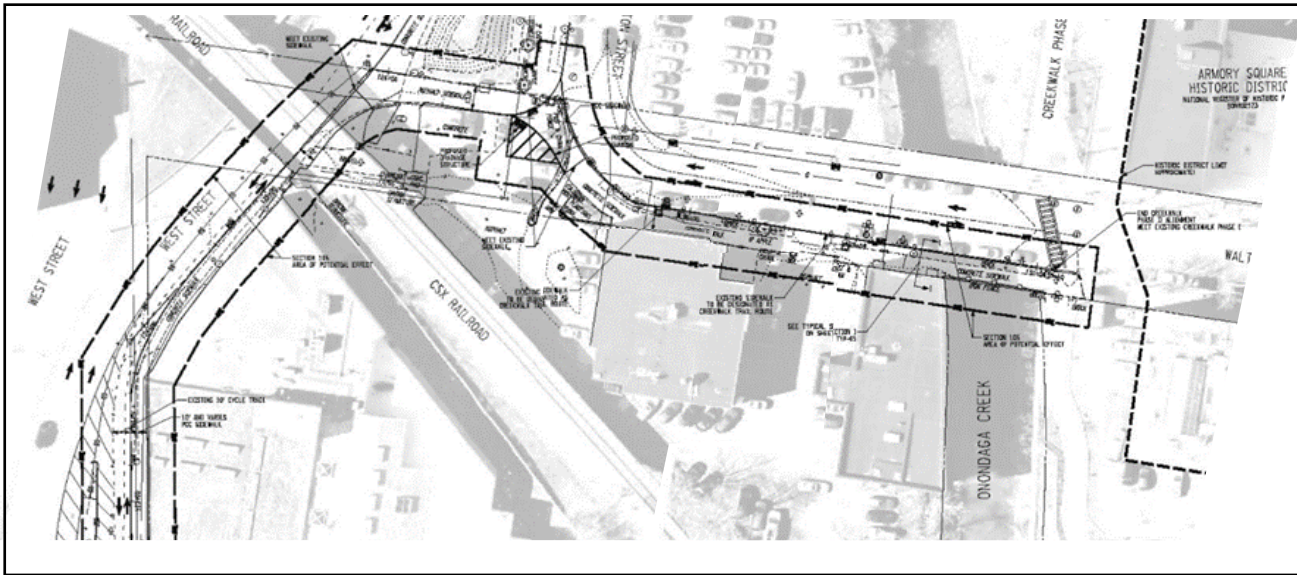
Creekwalk Phase II. Design drawing from the City of Syracuse's Creekwalk Phase II Draft Design Report shows the trail connecting West Street and Walton Street, extending along Walton Street to Onondaga Creek
